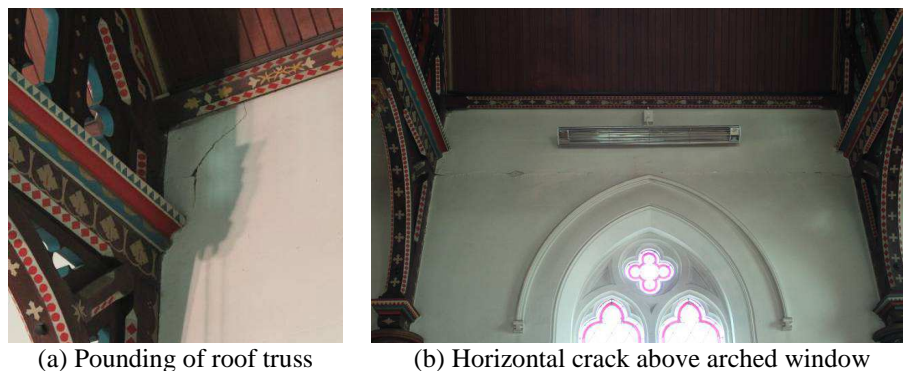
St James' Church, showing pounding of roofing elements on the walls of the nave
